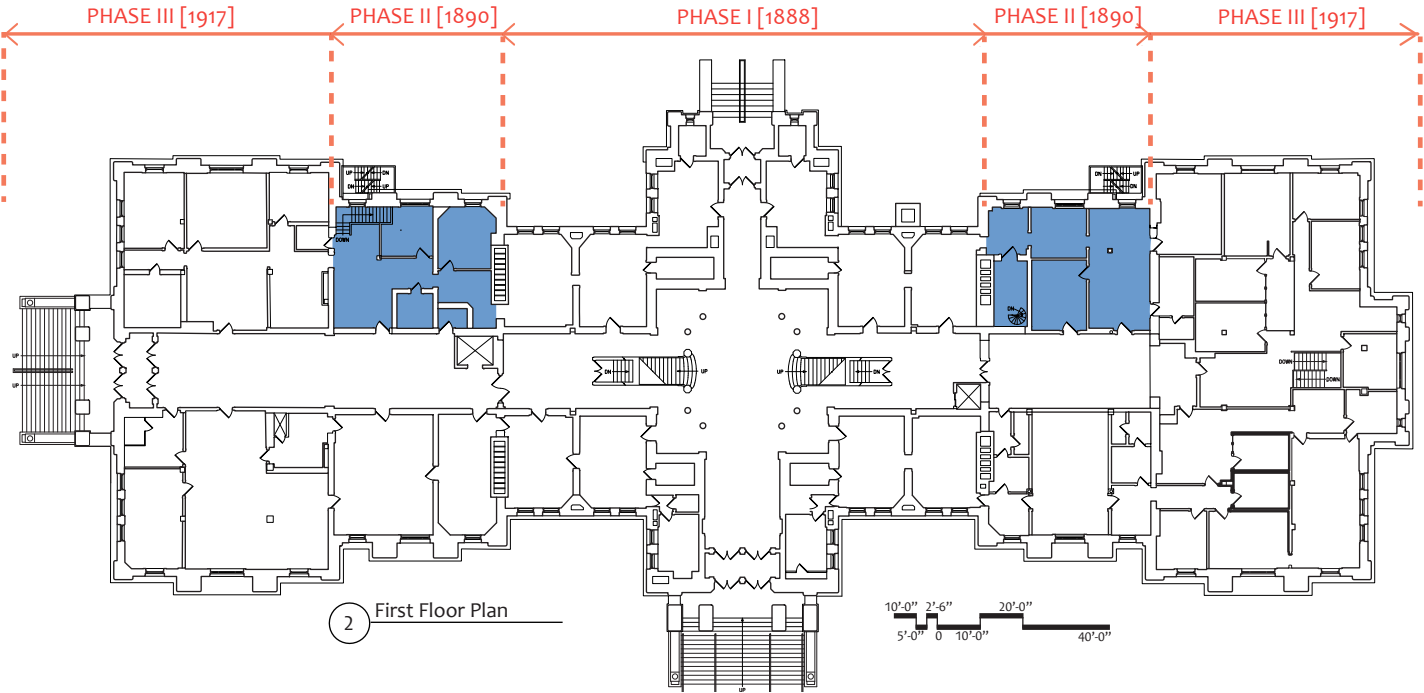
First Floor Plan of Service Cores [highlighted in dark blue]
